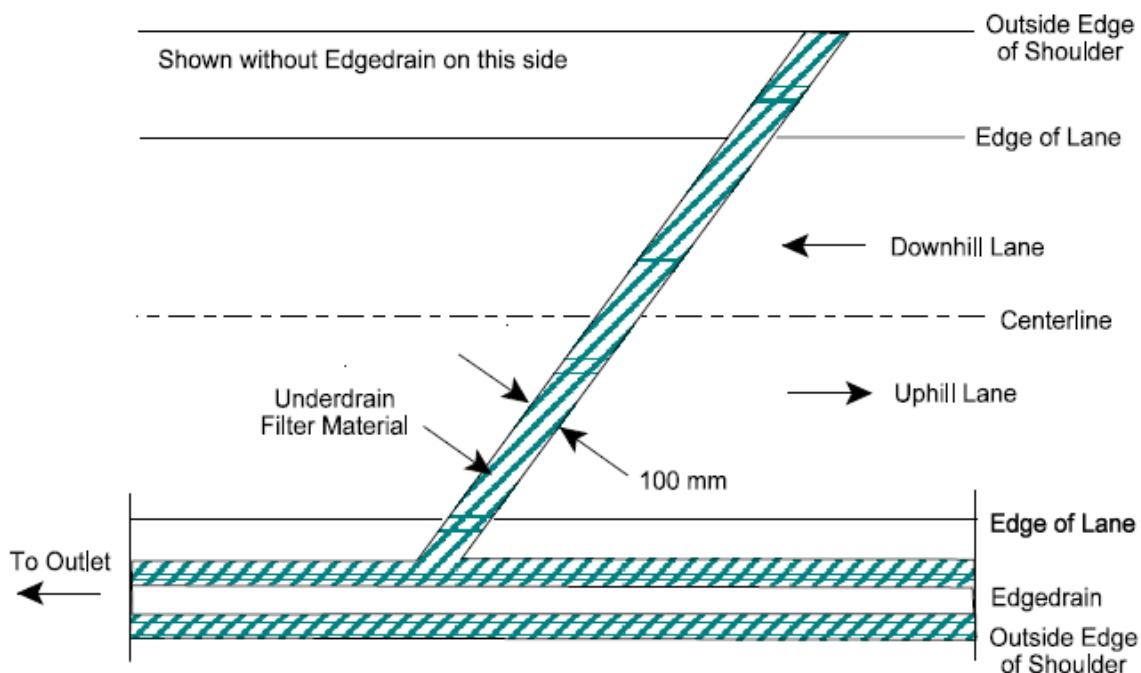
Typical Horizontal Drain (NYDOT 2002)
